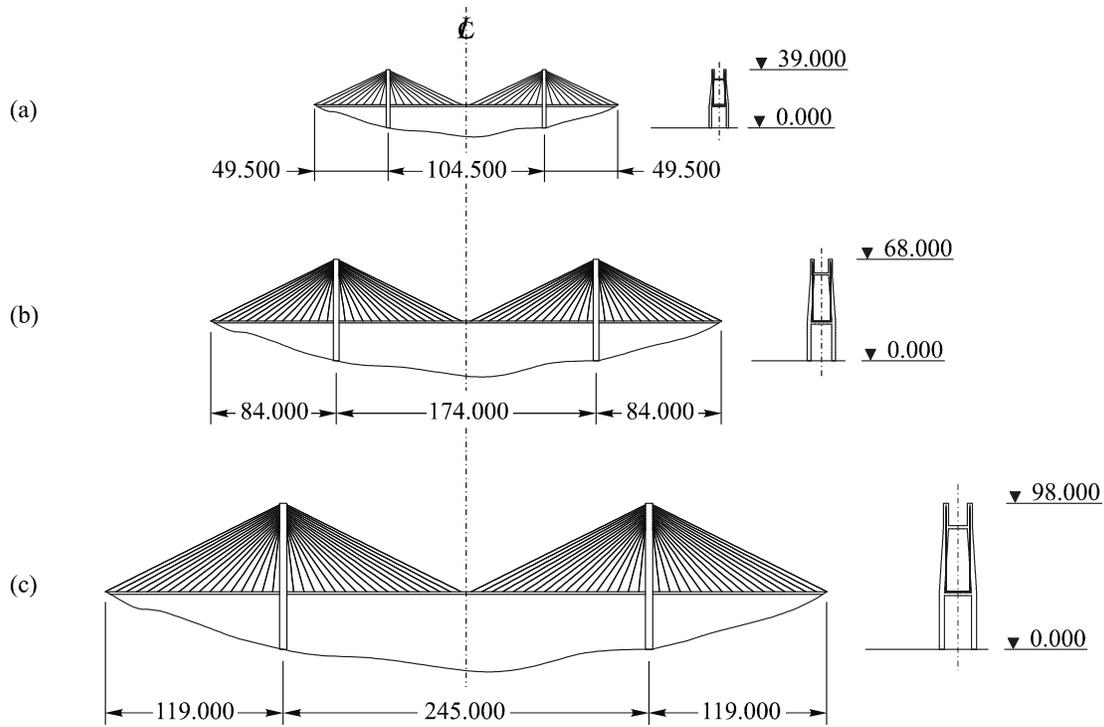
Elevations of the three bridge models studied (dimensions in meters).
